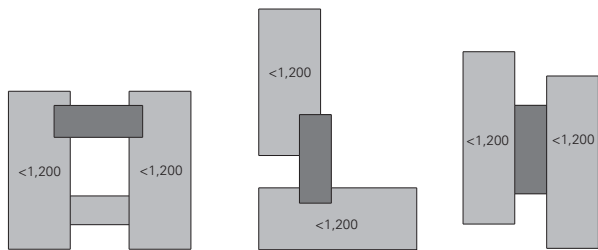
Commercial buildings with large floor plates expressed as separate building elements of not more than 1,200 square metres
